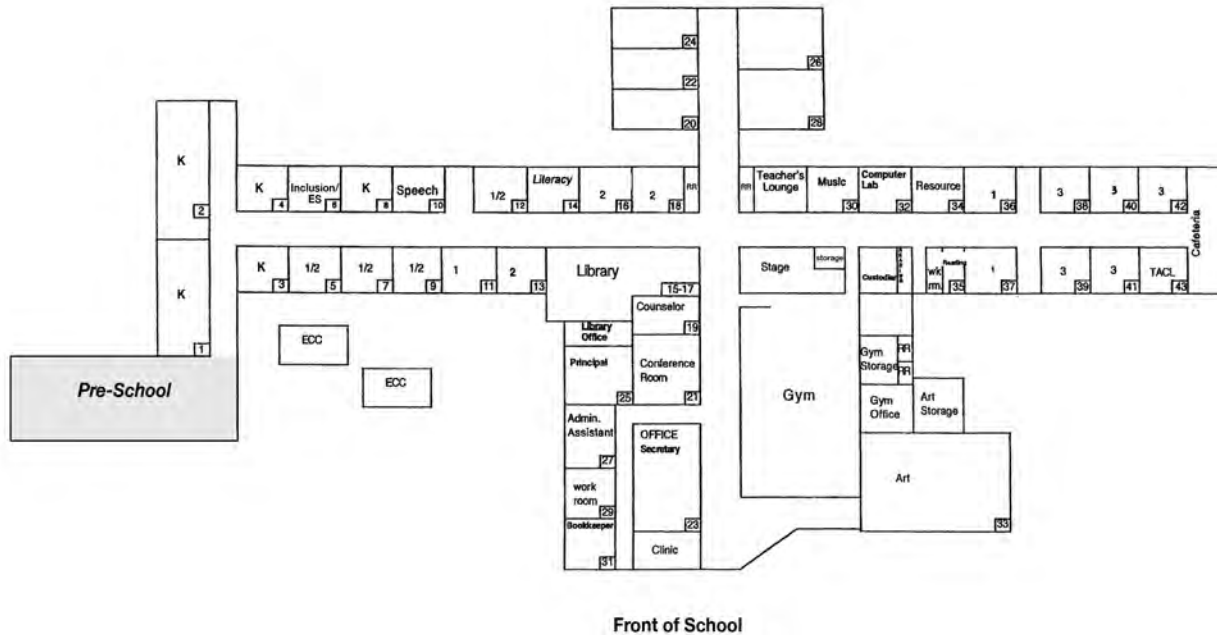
Layout of Woodson Elementary with pre-K classroom shaded.
